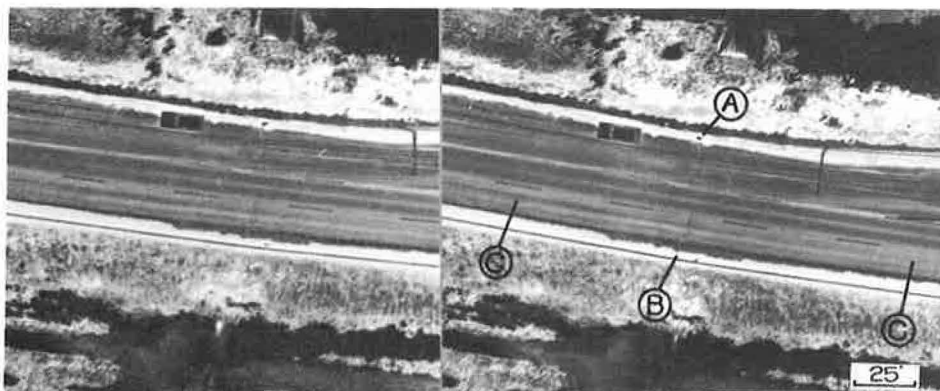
Stereopair of an unsealed transverse reflection crack and associated frost heave developed over a culvert in a recently placed pavement overlay. The crack was about 1" wide and the heave was a little over $\frac{1}{2}$ " high and 18" wide on March 11, 1968 when the photo was taken. The crack extends from the man standing on the ramp shoulder at A to the passing lane shoulder at B. The ripple or washboard pattern C is distinct in the passing lane but not in the travel lane. The stereogram is constructed with negative black and white enlargements made from Ektachrome Infrared Aero positive transparencies having an original scale of about 1"=200'
